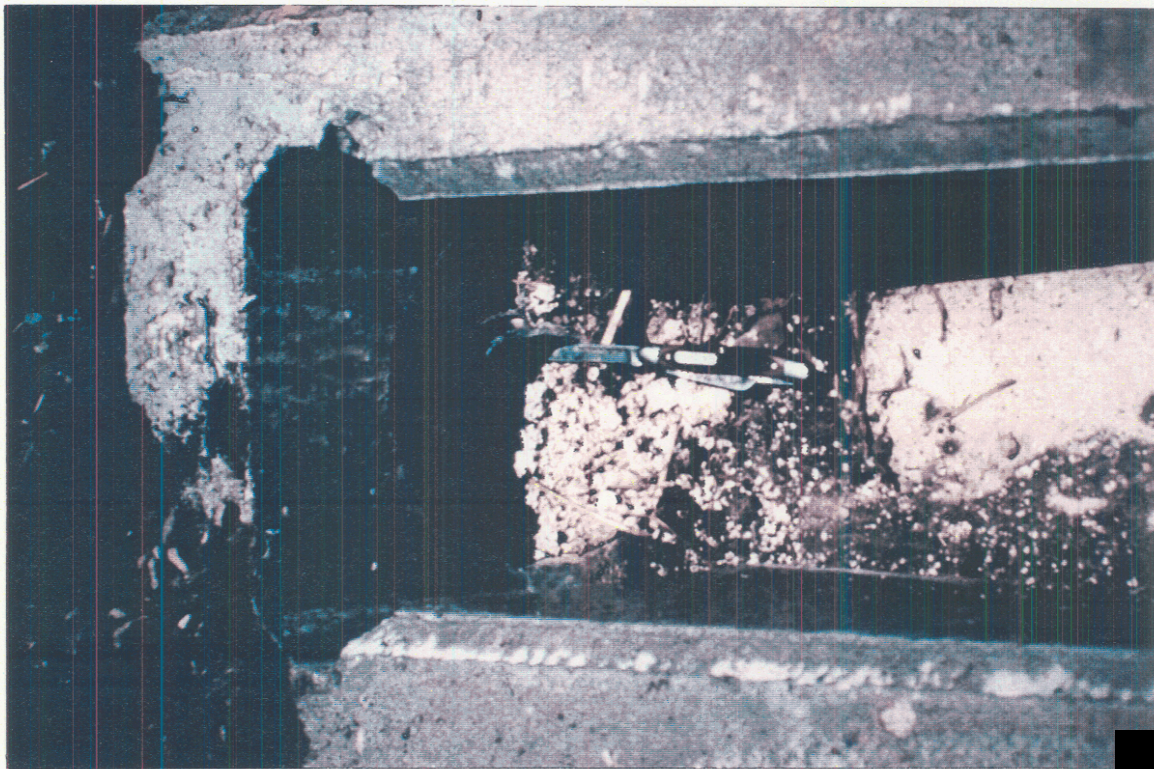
Photo of typical I-90 (Austin, MN) drain outlet, 1987.
